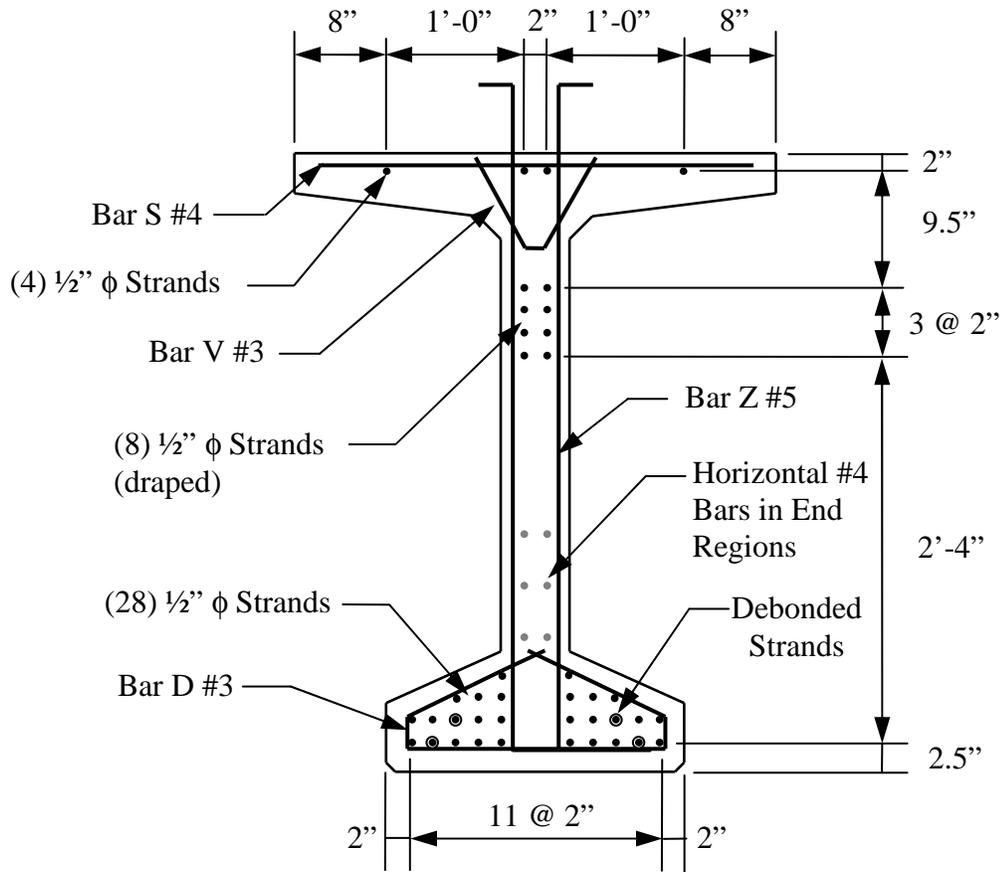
Mild Steel and Strand Arrangement for BT-54 Girder at End of Span
